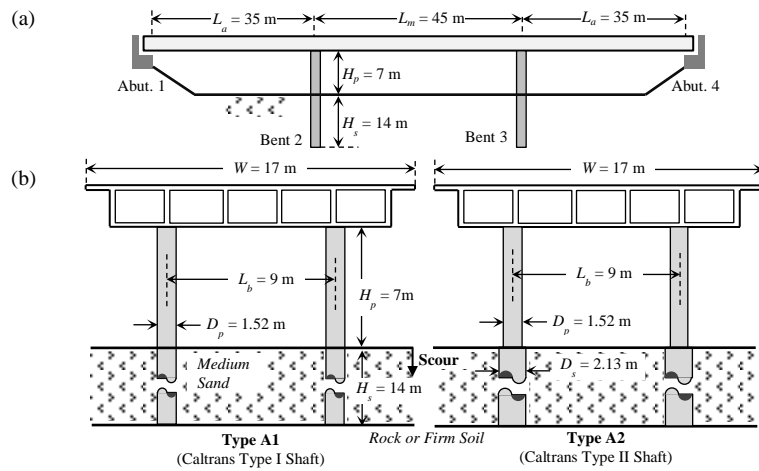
Schematic views of Type A bridges; (a) elevation view, (b) substructures
